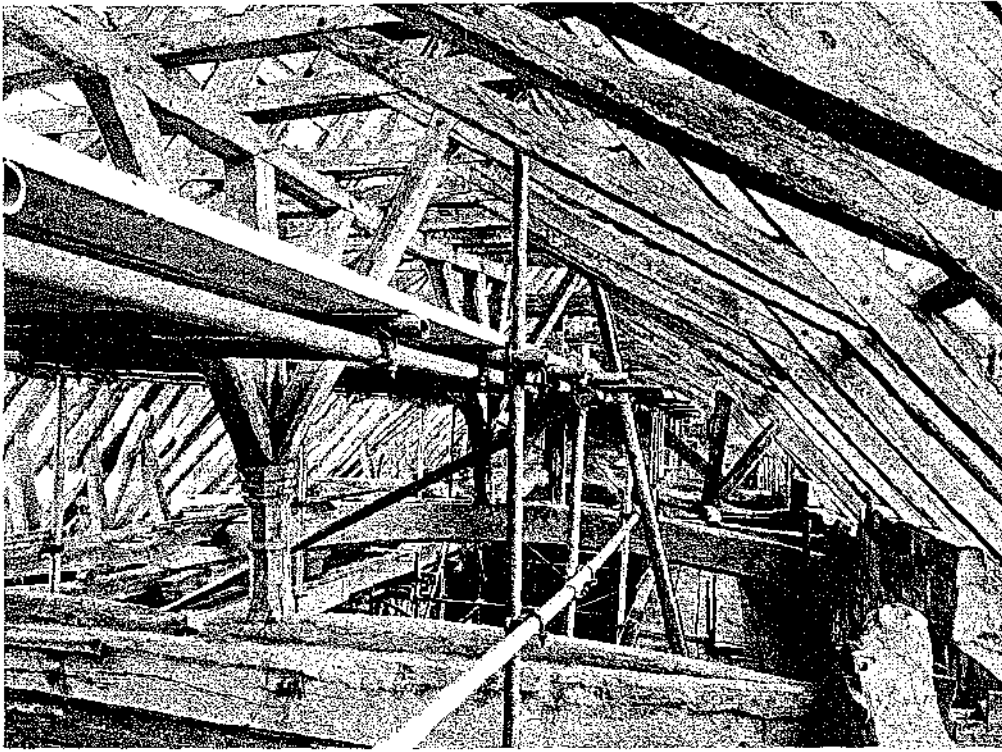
Structure 1, detail of crown-post roof, looking east (English Heritage).
